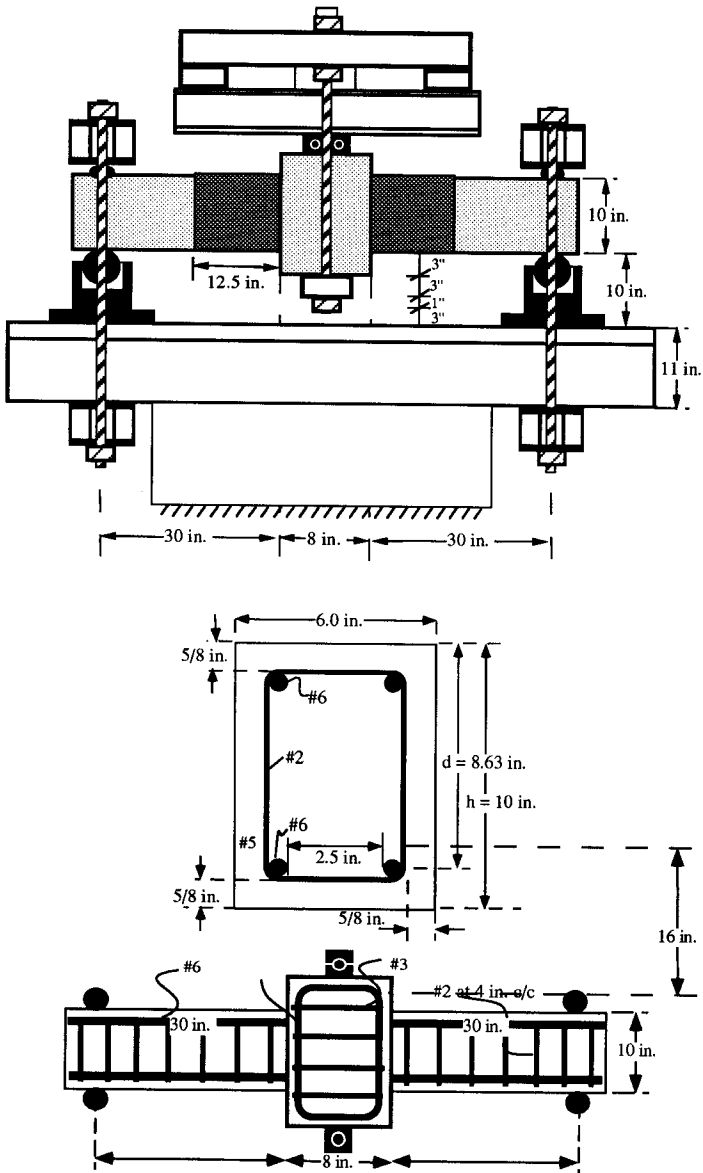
Experimental set-up and reinforcement layout (1 in. = 25.4 mm).
